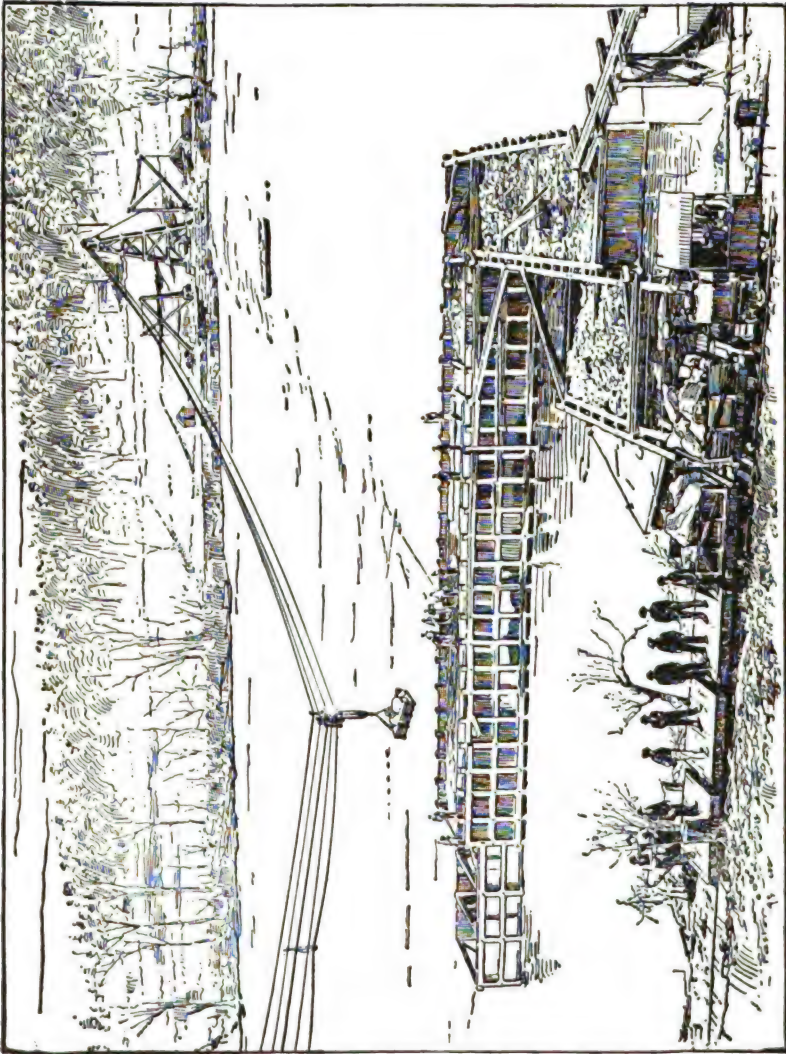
LIDGERWOOD CABLEWAY AT COOSA DAM. SPAN 1012 FEET.
